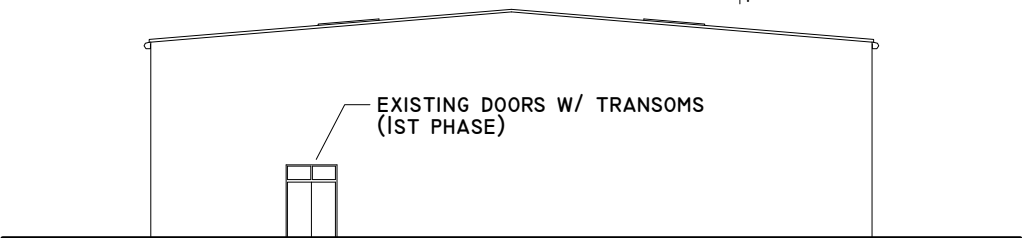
# EXHIBIT C -- PHASE I (BUILDING (SHELL))
